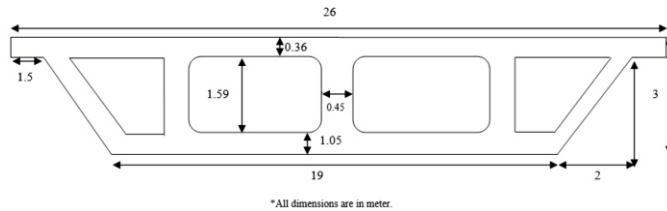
Schematic Diagram of Multi-cell Concrete Box Girder
